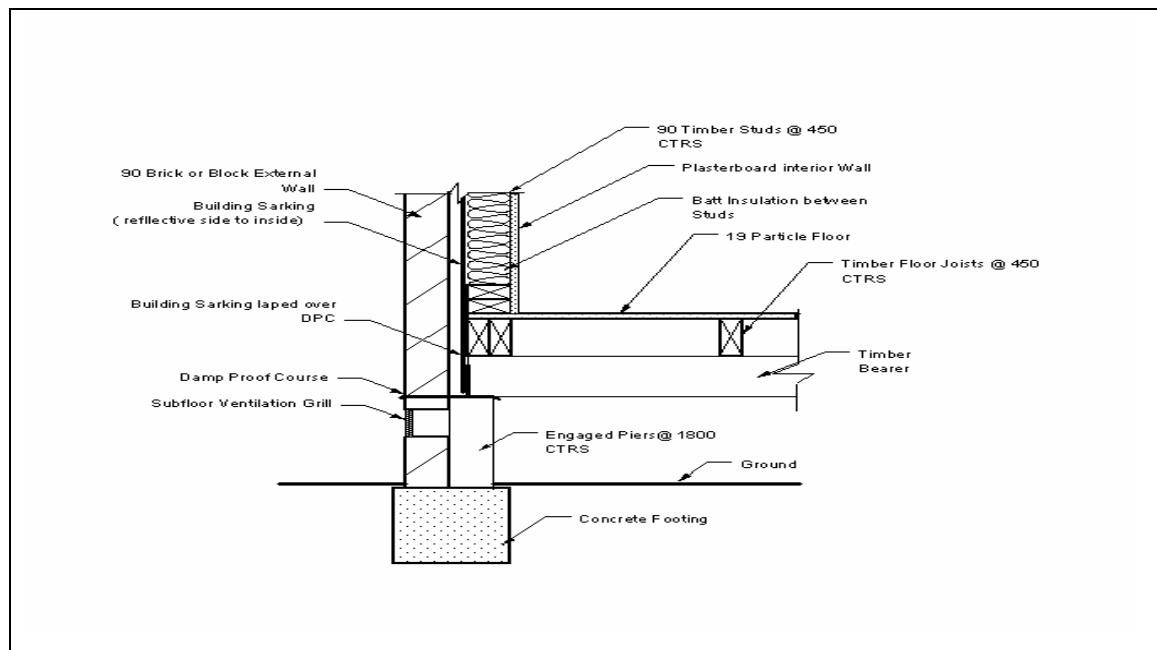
Enclosed timber platform construction detail at the 4 and 5-star test houses
